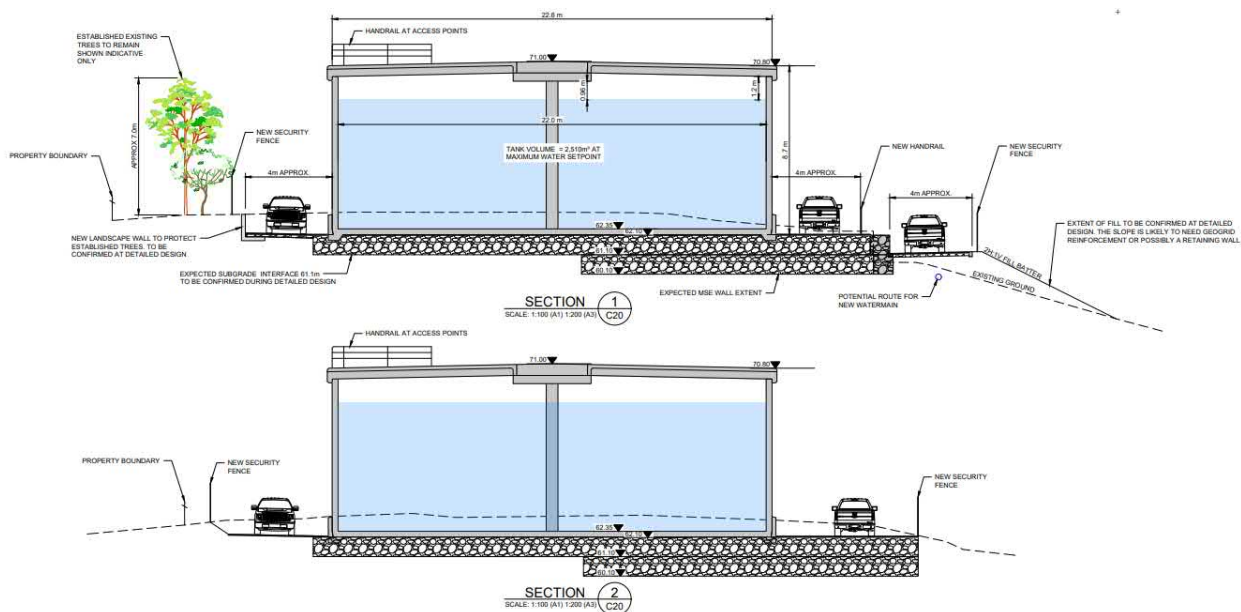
Proposed Cross Sections (to: West – East, bottom: Northwest - Southeast)
